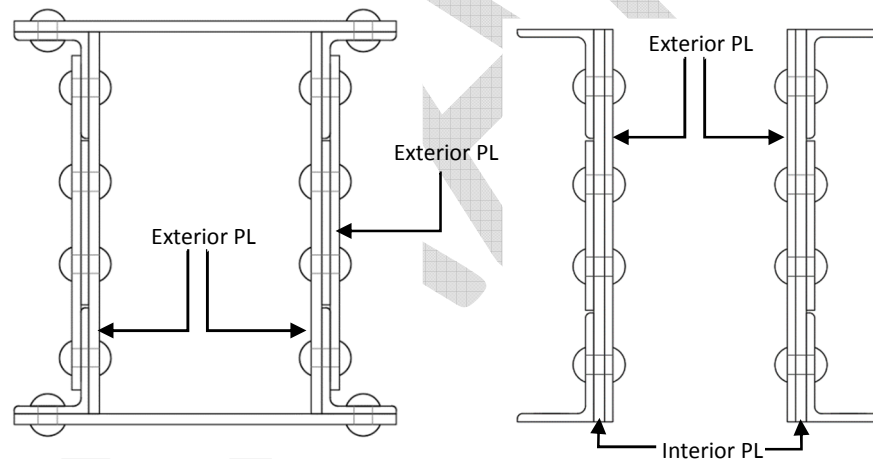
Illustrations of typical built-up members (Left) box member with all exterior plates, (Right) channel member (lattice removed) with interior and exterior plates
